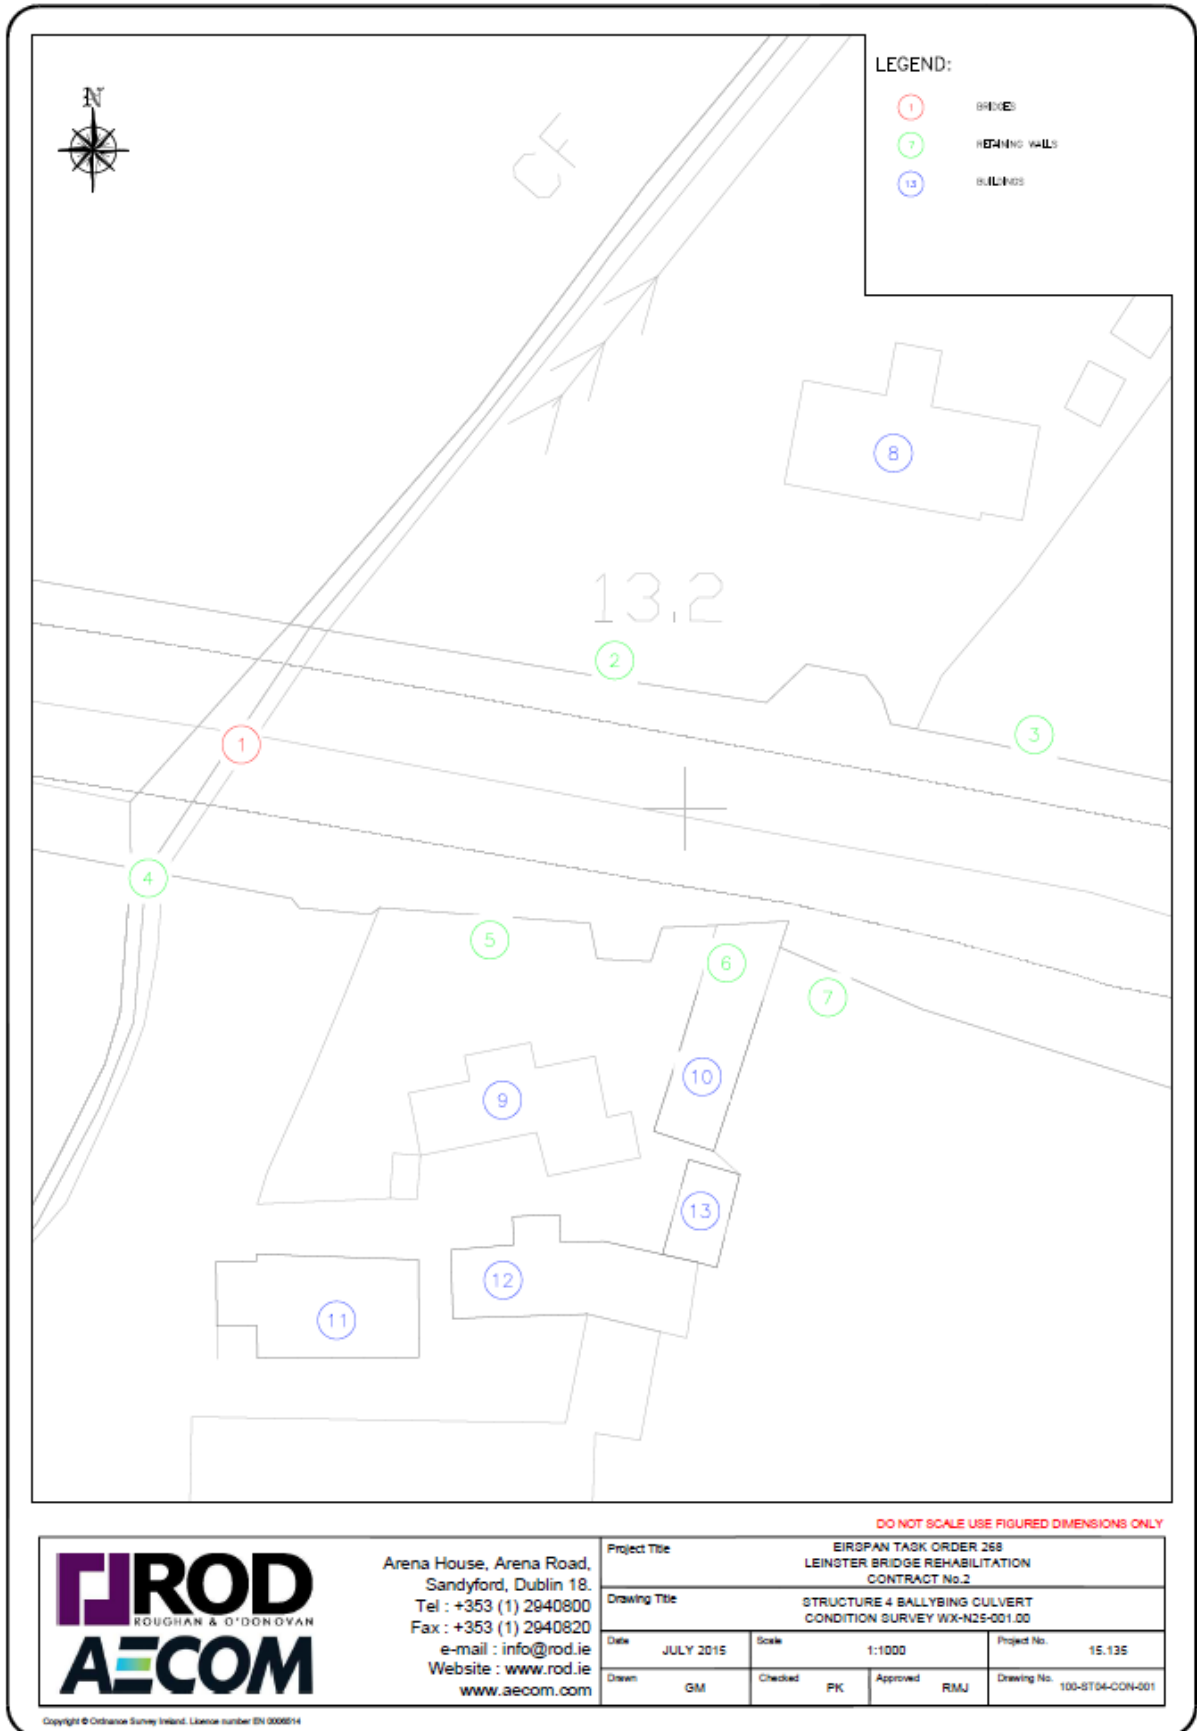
/73/4 Str04 Ballybing Culvert WX-N25-001.00
